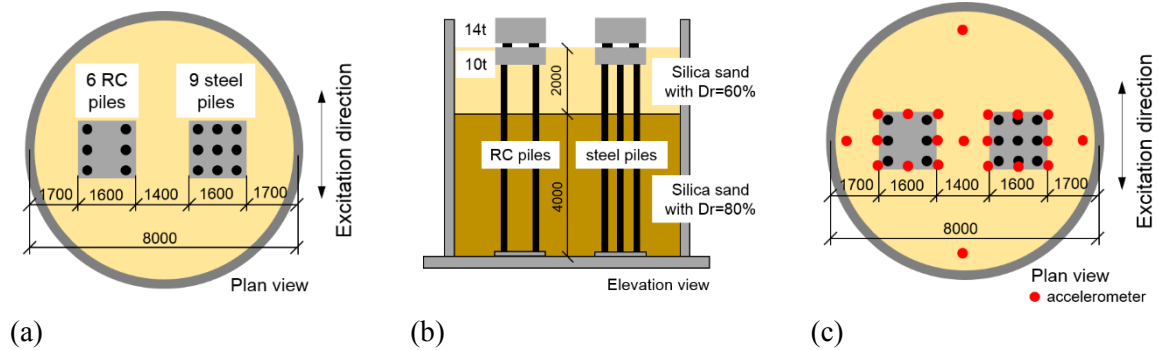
basic setup of E-defense substructure experiment model (unit: mm); (a) plan view; (b) elevation view; (c) location of accelerometers
